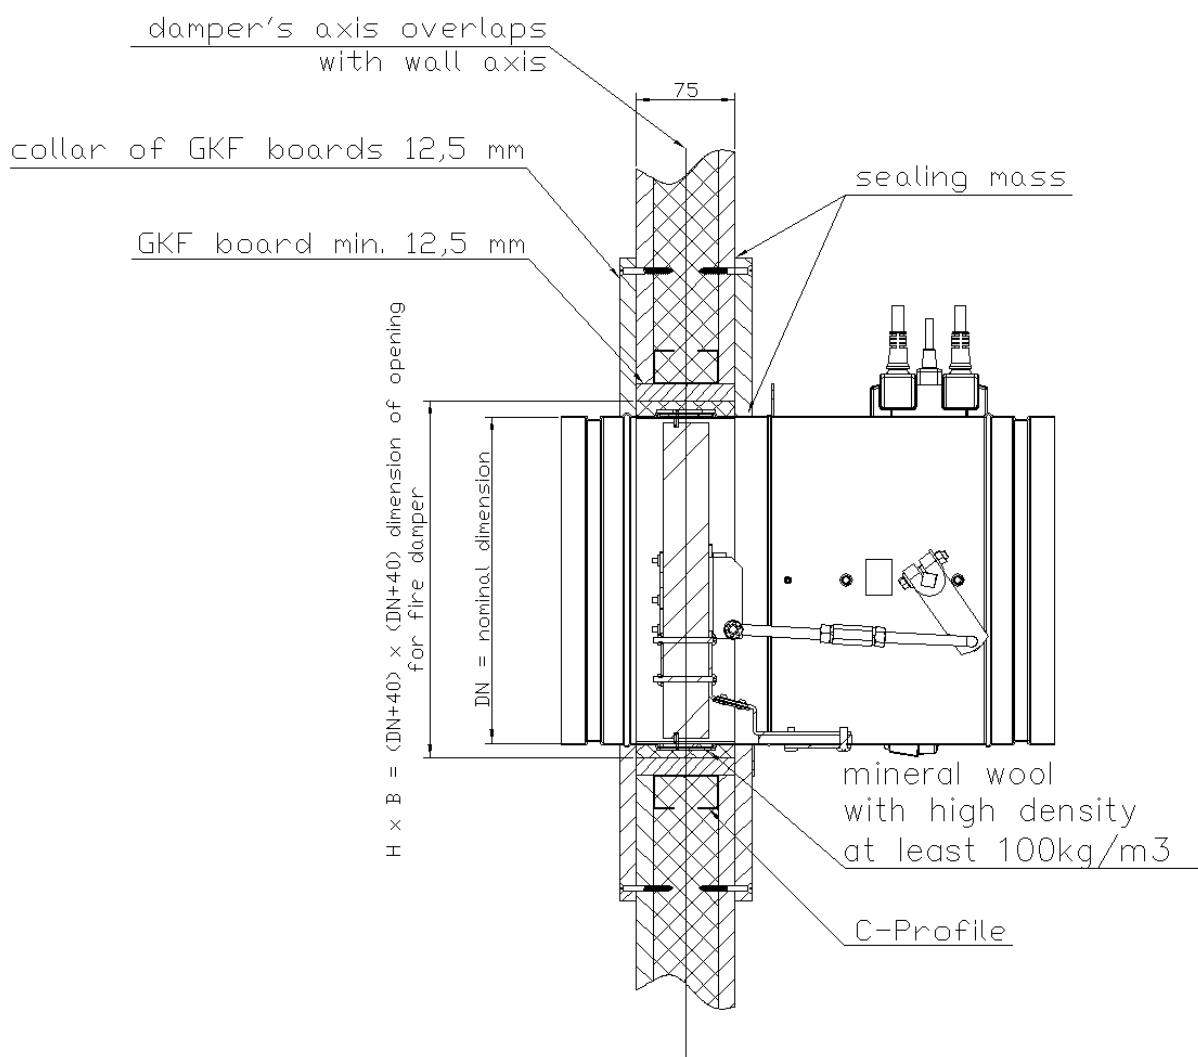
Installation of KTS-O in flexible wall construction with 75 [mm] thickness
